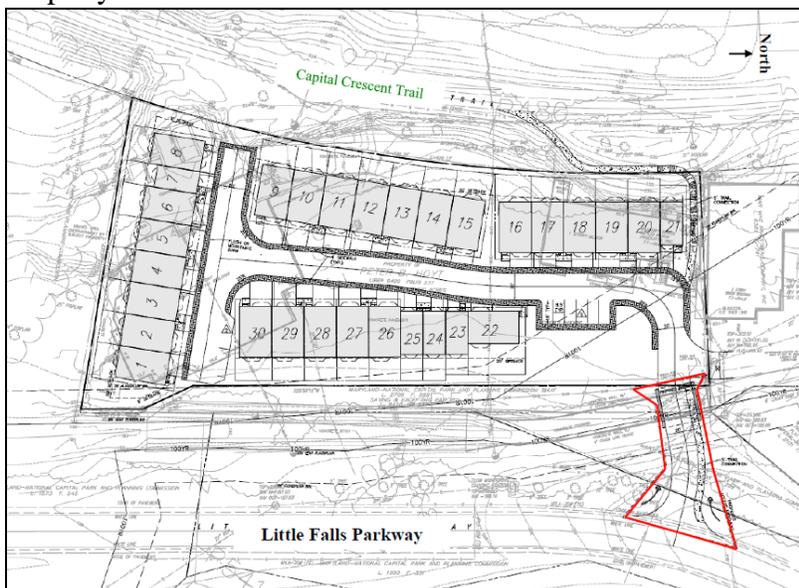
Current site plan for Hoyt Property redevelopment and proposed location of access easement
